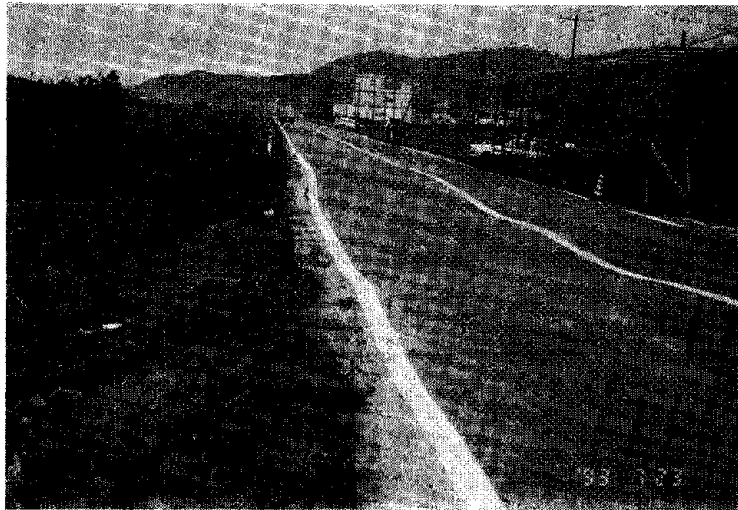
Permanent Undulating Deformation of Road Surface (National Road 5)
